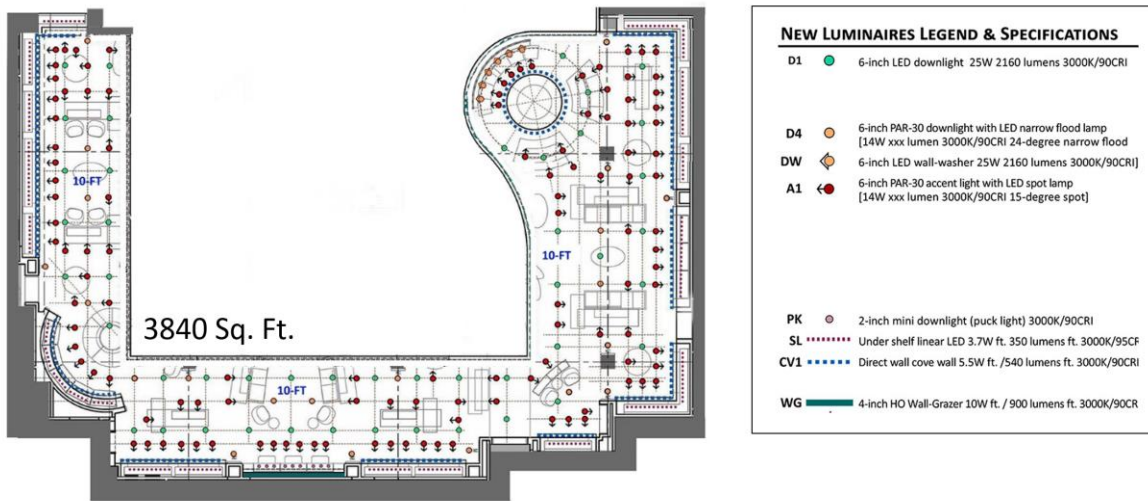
Reflected ceiling plan low ceiling women’s shoes.
